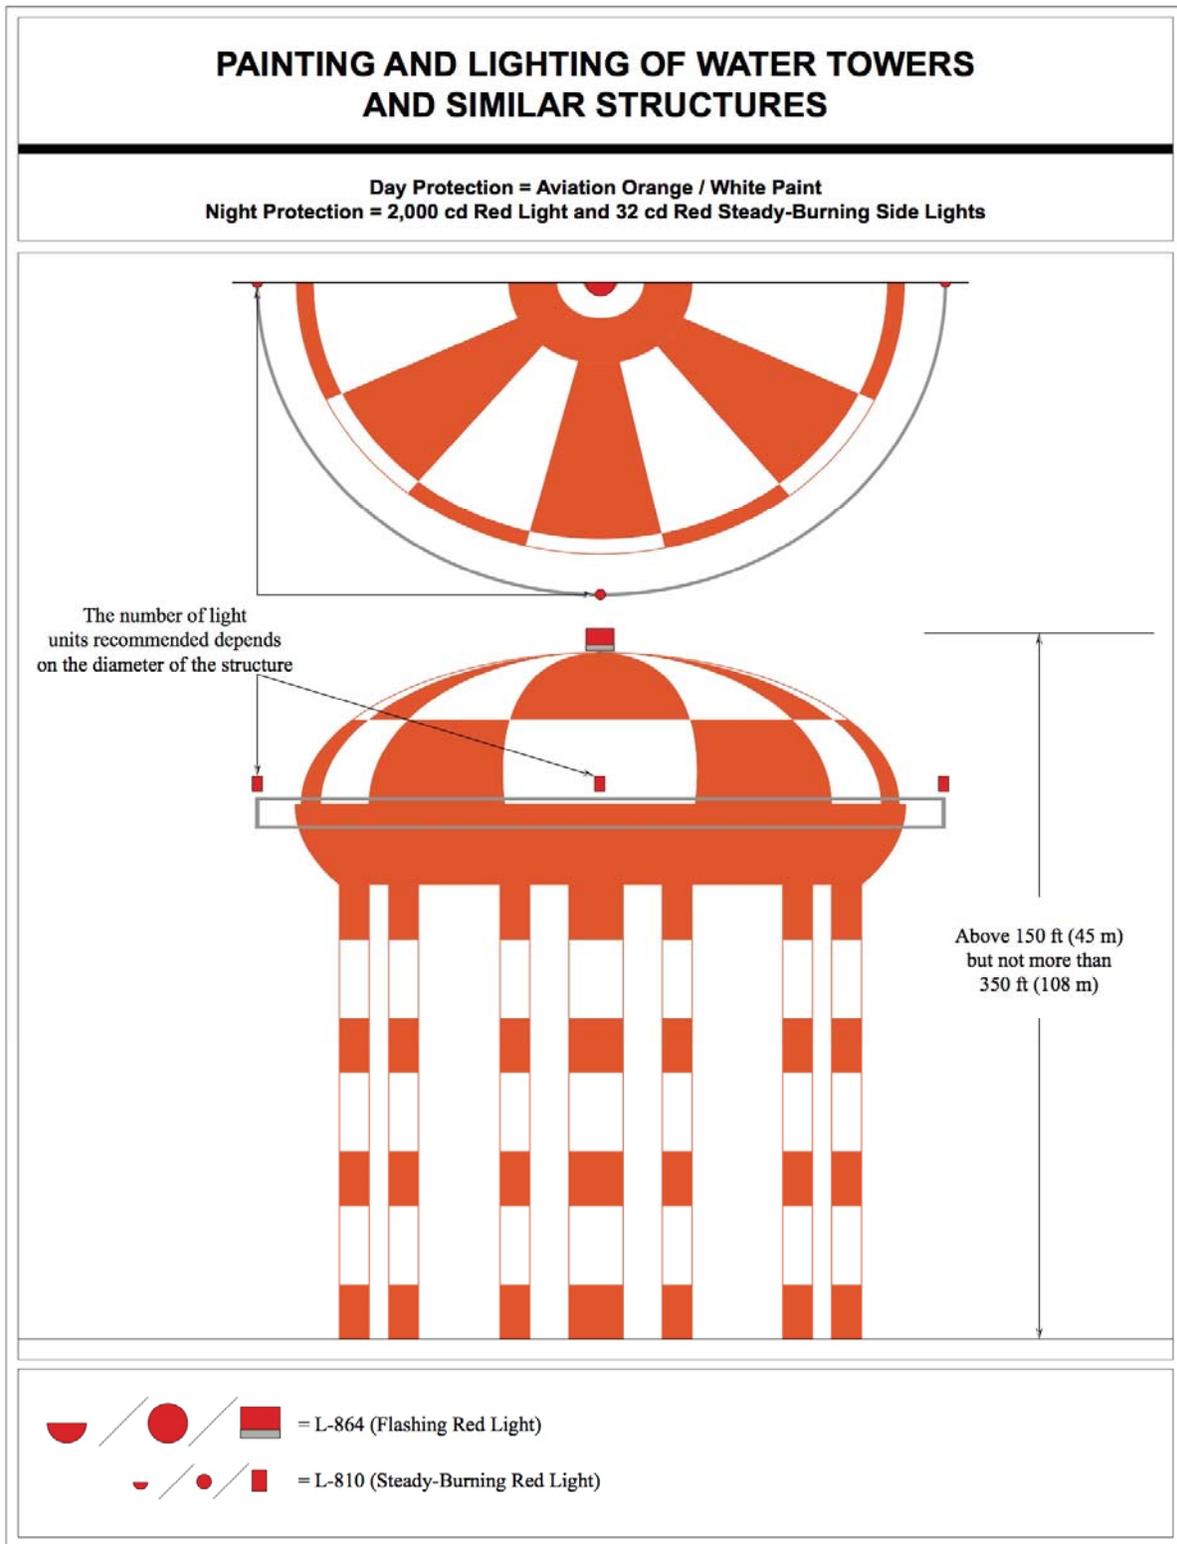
Painting and Lighting of Water Towers and Similar Structures
